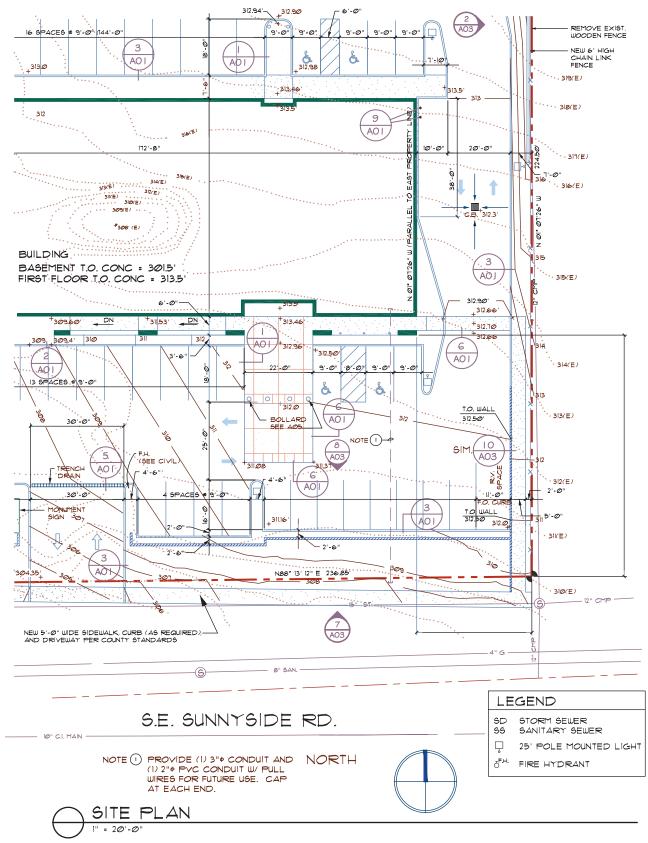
A commercial site plan can be completed by a CAD technician working for an architect or a civil engineer. *Courtesy Peck, Smiley, Ettlin Architects.
